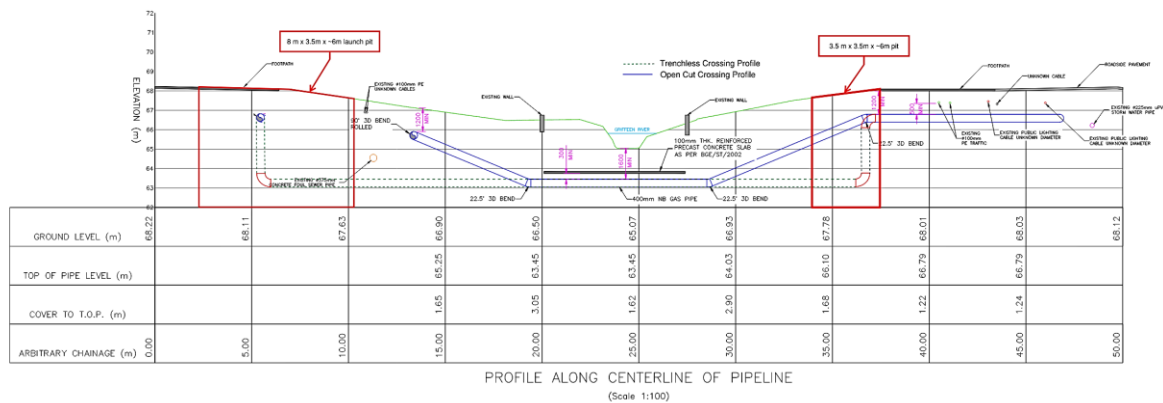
Ground Elevations from Topographical Survey and Crossing Profile
